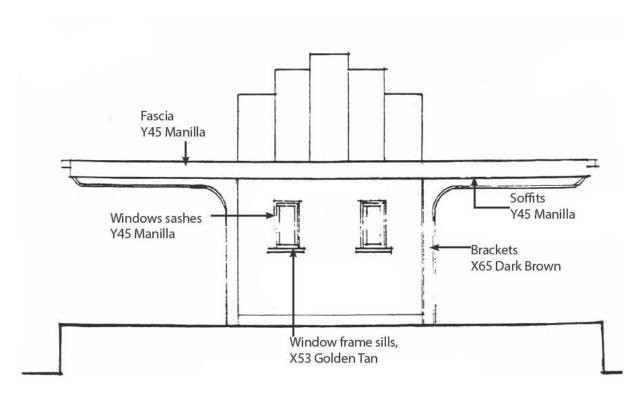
Island Platform Buildings - Masonry (post 1935 design)
